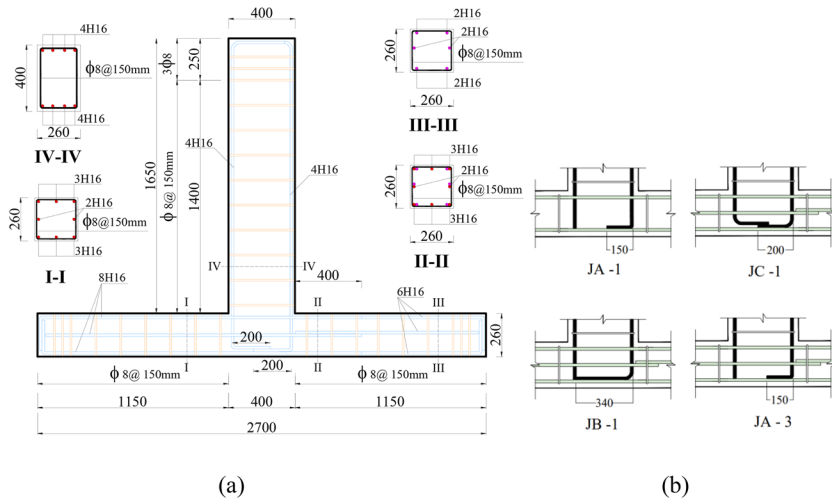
Tested joints (a) geometry and reinforcement detailing, (b) detailing of longitudinal beam reinforcement into the core (units: mm)
